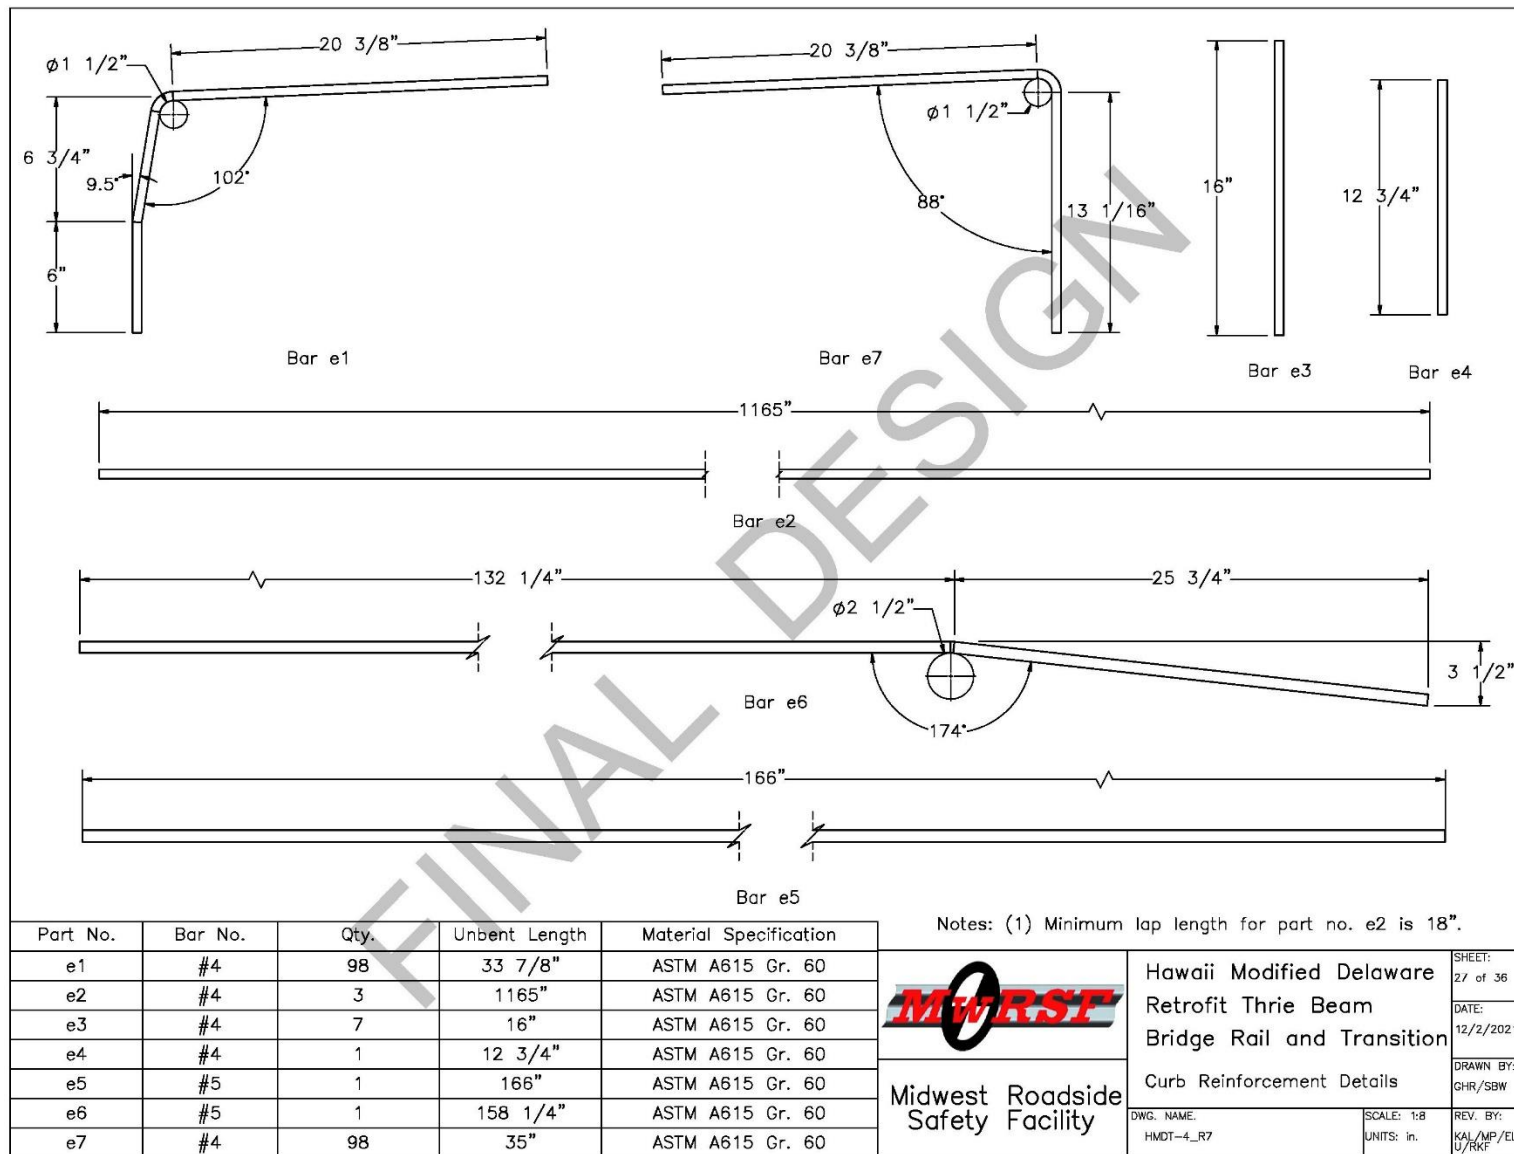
Curb Reinforcement Details, Test No. HMDT-4
